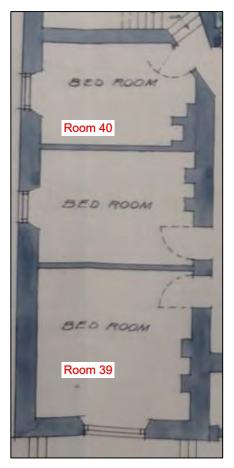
Extract from the 1929 plan showing Rooms 39 and 40, prior to reconfiguration (BARS ref: RDB P 1/1314)
